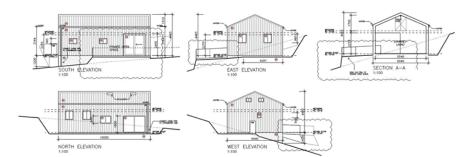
Shed Elevations (Steven Spizick Architect, 2021)
